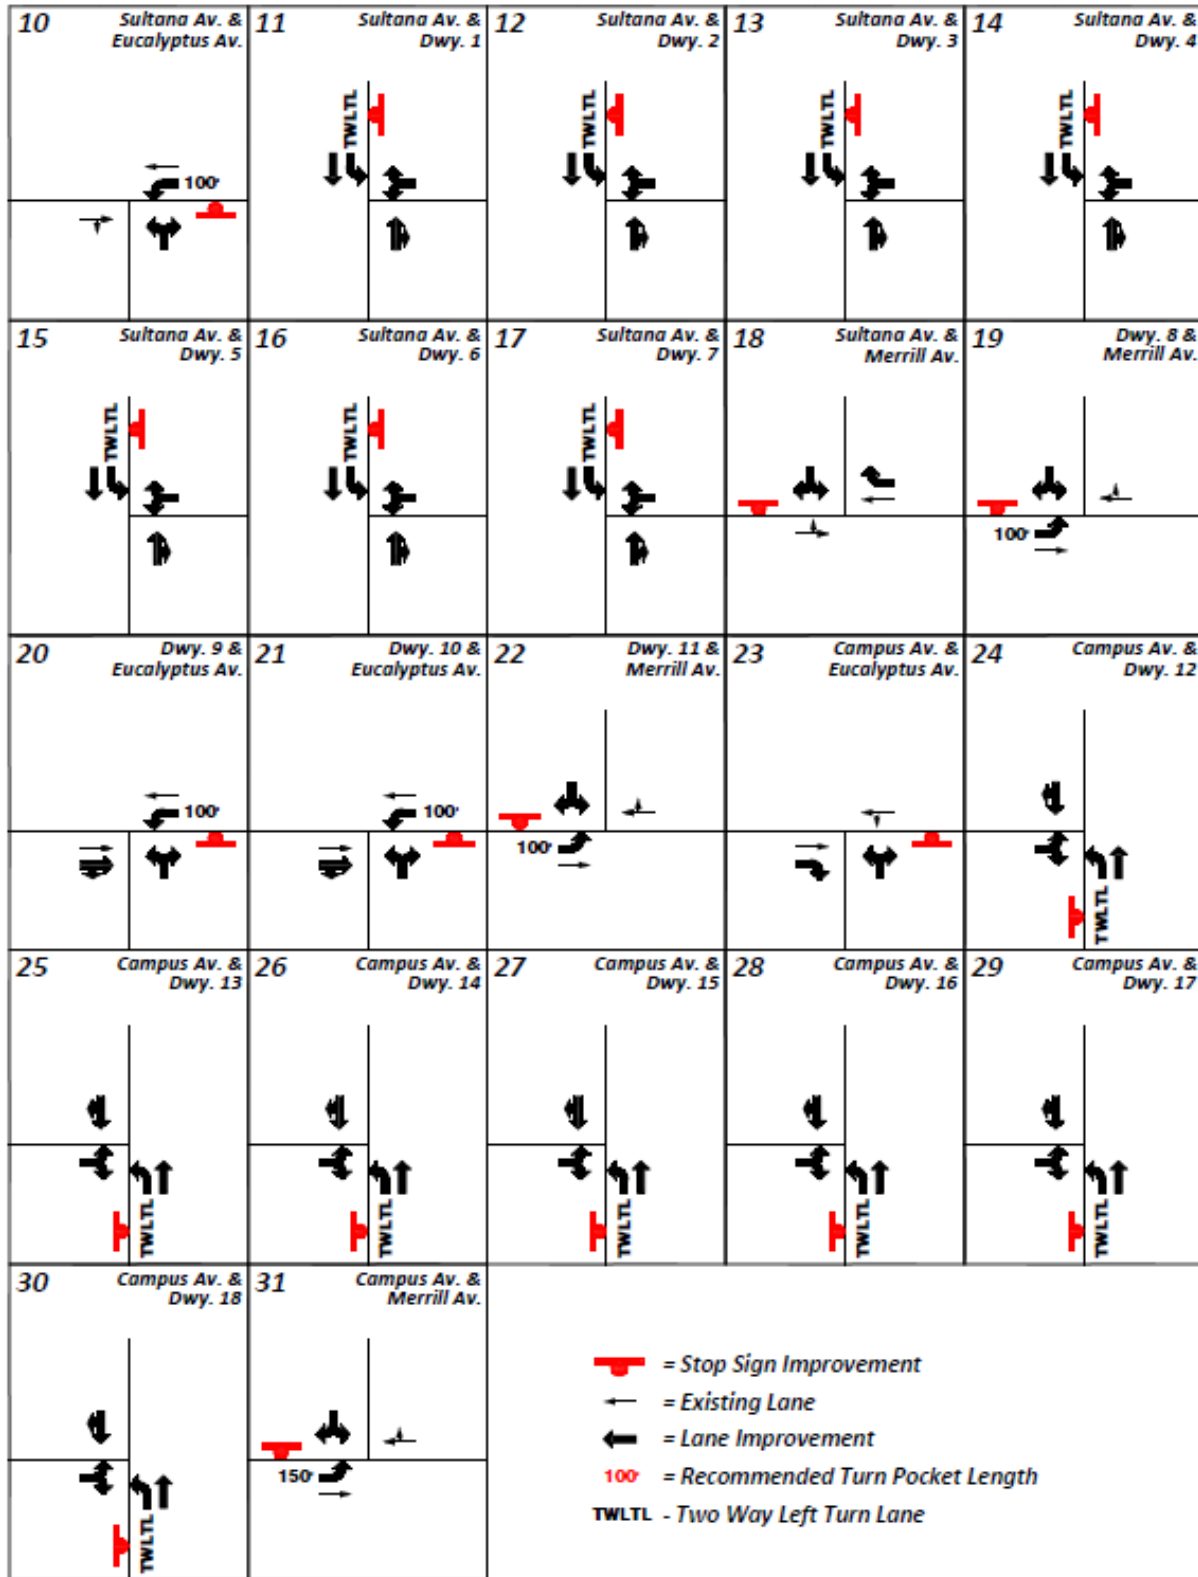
SITE ADJACENT ROADWAY AND SITE RECOMMENDATIONS (2 OF 2)
